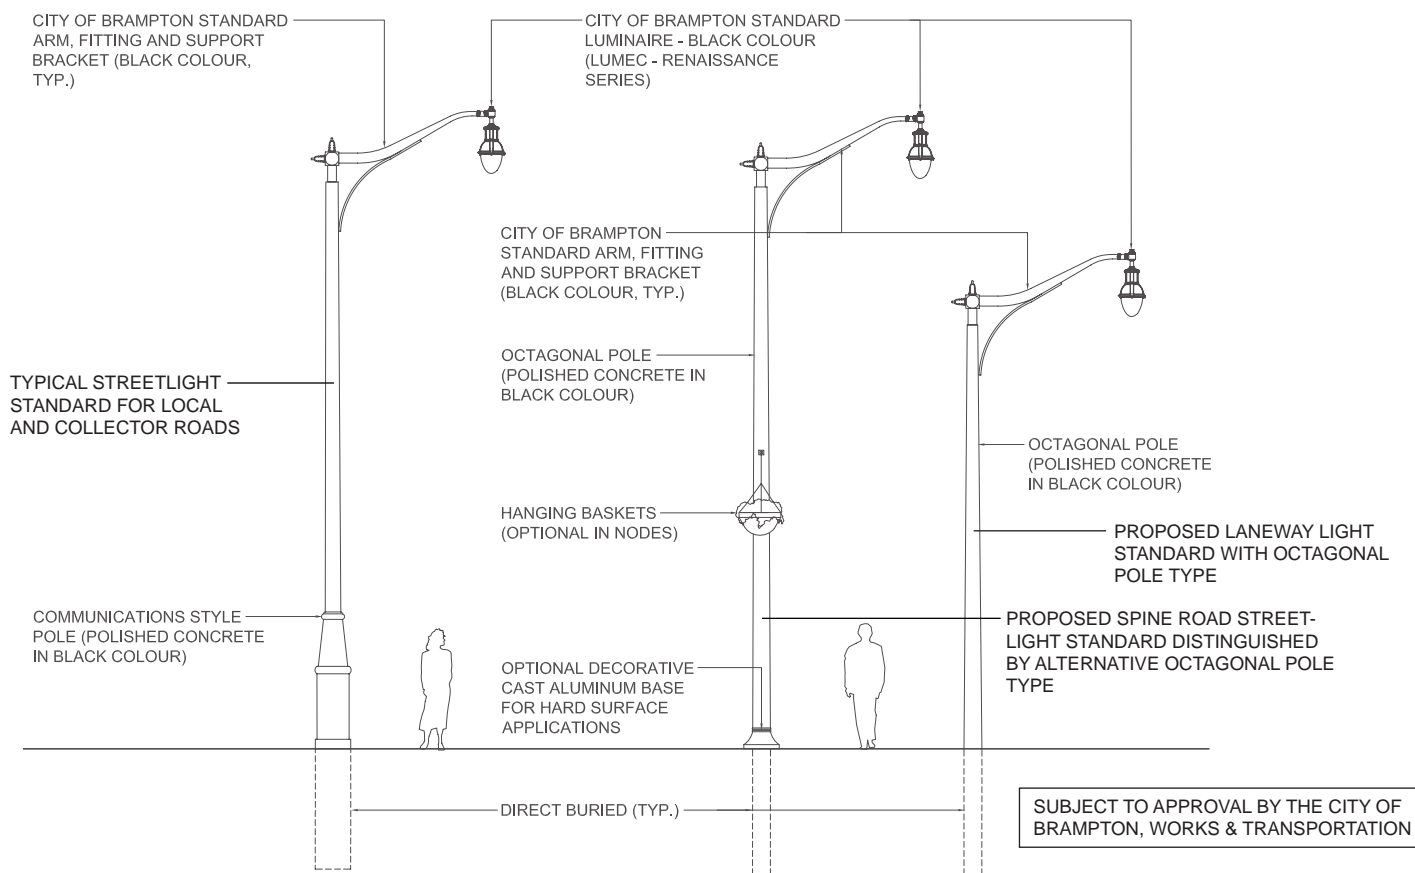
Street light standards proposed for all roads within Block Plan 51-1 except the Spine Road will reflect the City of Brampton standard with communications style pole and Lumec Renaissance series luminaire (in black). Light standards along the Spine Road will integrate a unique, simple octagonal pole with similar luminaire to help distinguish the road as the character avenue for the community. An optional decorative cast aluminum base is specified for hard surface applications (within paved surfaces). Light standards within laneways will similarly integrate the octagonal pole option. All proposed street light standards are subject to approval by the City of Brampton, Works & Transportation.
